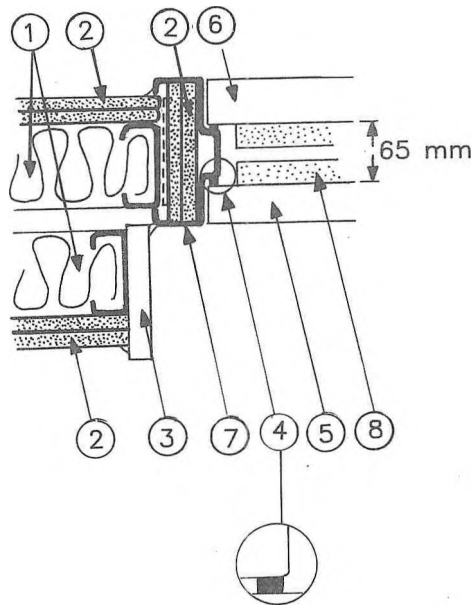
Cross section sketch showing installation of the single doorframe in the partition. Door separation is 65 mm.
